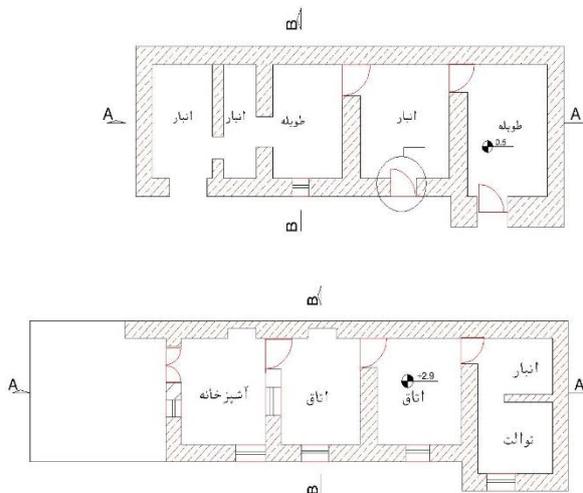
ground and first floor plan of the first sample of rural house, (authors)
